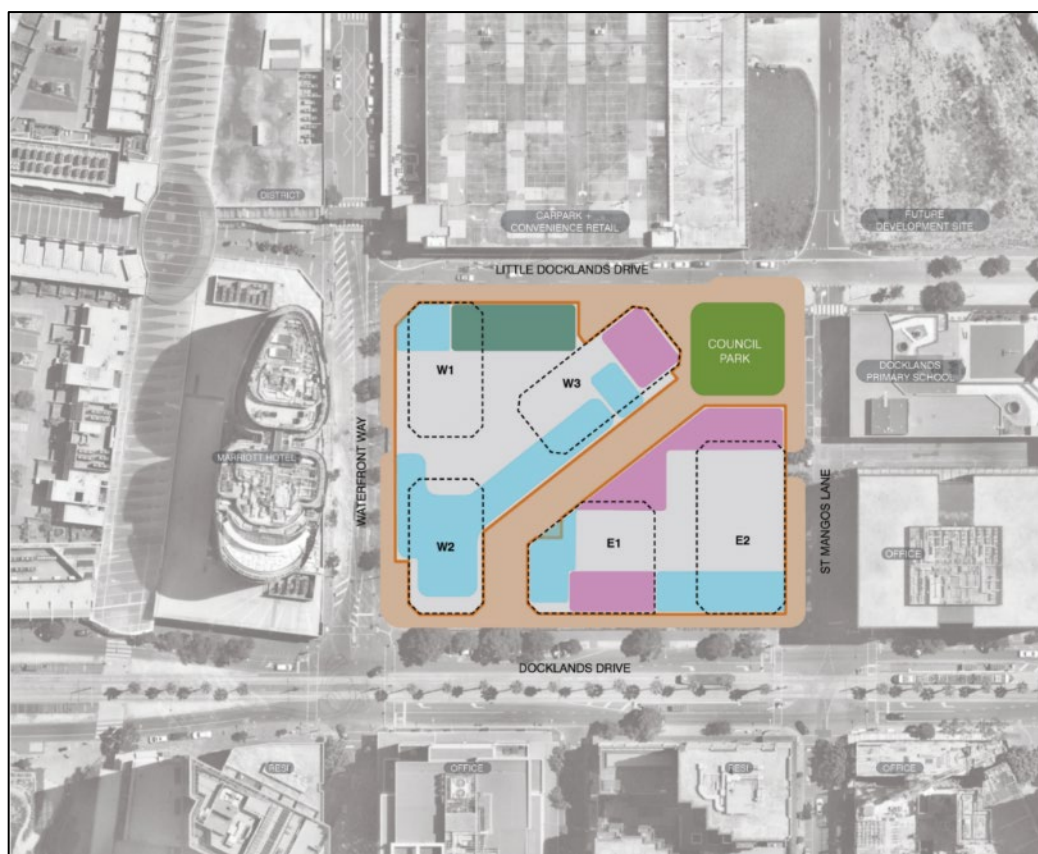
Extract of the Precinct Plan from the proposed NewQuay Development Plan August 2023 (source: NewQuay Development Plan August 2023)
